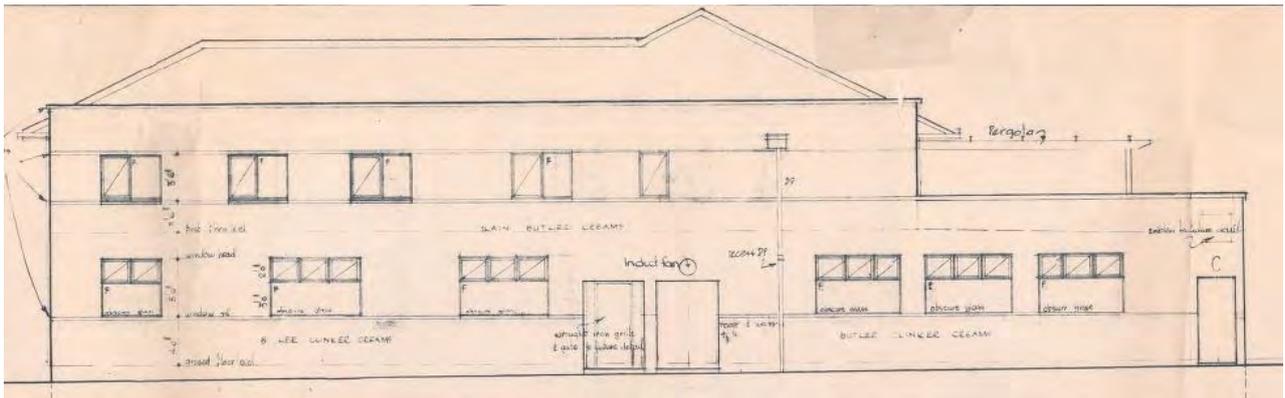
East elevation. Drawing related to building permit 57/1421. (Best Overend Architects, 1960) (Source: Council Building File)
